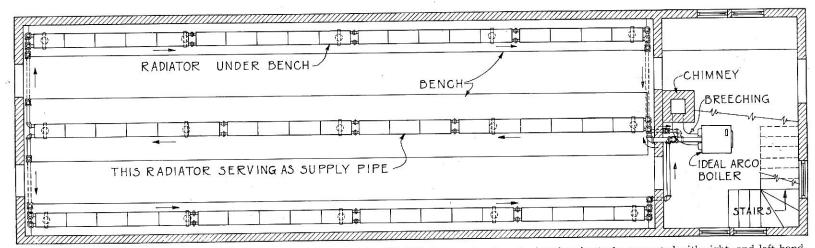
Plan of typical greenhouse, showing runs of AMERICAN Peerless Wall Radiators placed under benches, in stacks connected with right- and left-hand threaded hexagon nipples. Dotted lines indicate where the ARCO Greenhouse Radiator Post Supports are placed to uphold the stacks of Radiators, and as further illustrated and described on page 50. Radiators shown on this plan are of the "B" type, which in this arrangement offer freer circulation of the heating medium.
